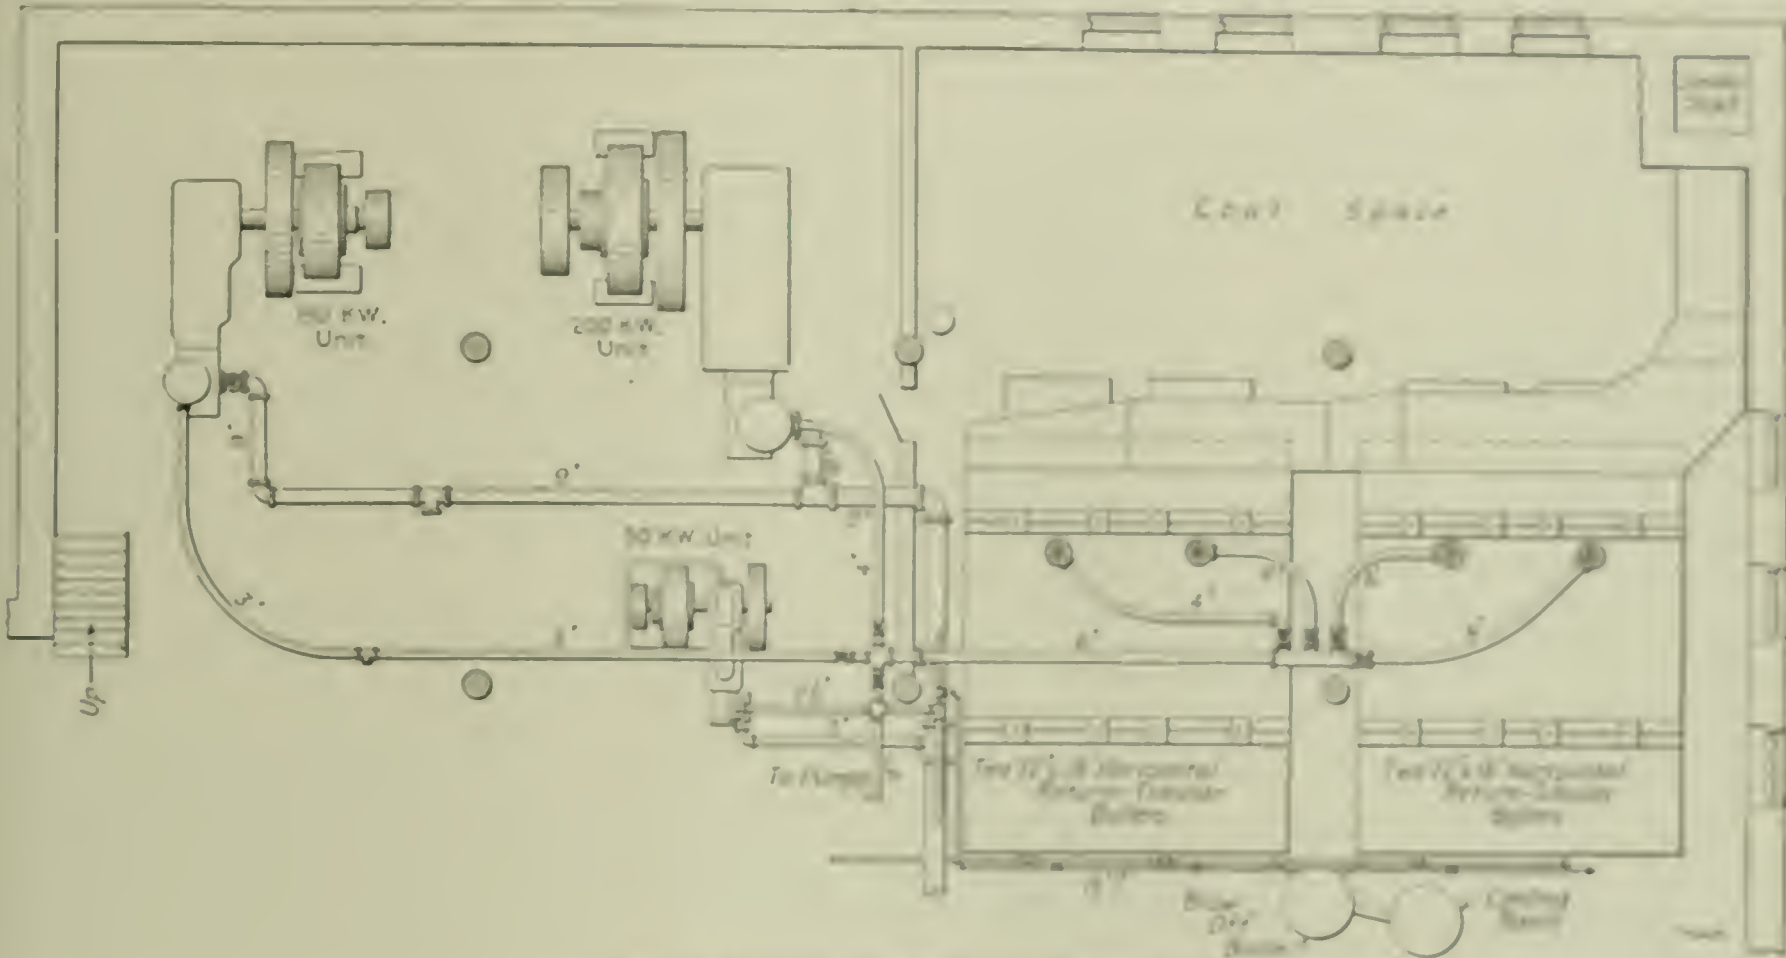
LAYOUT OF MAIN STEAM PIPING
